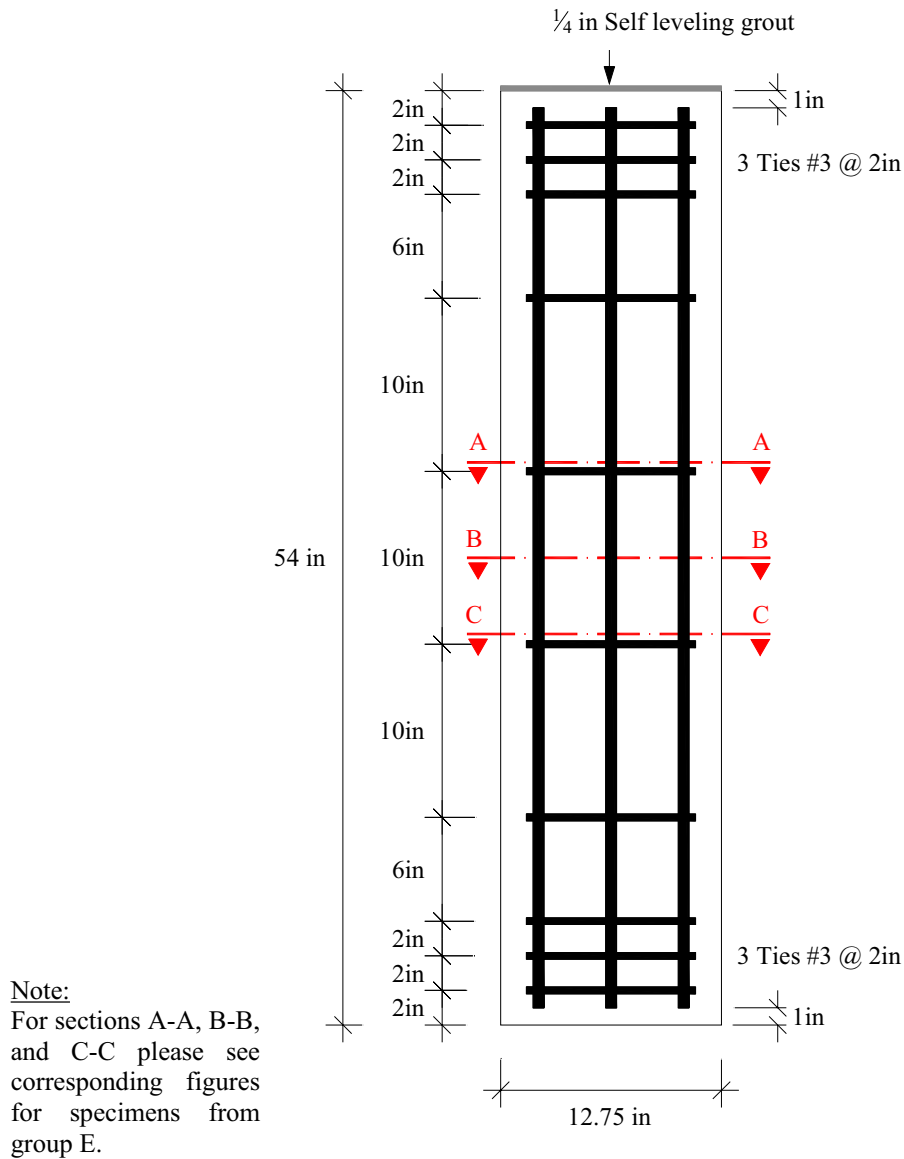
Longitudinal Cross Section; Specimens F1, F2 & F3
